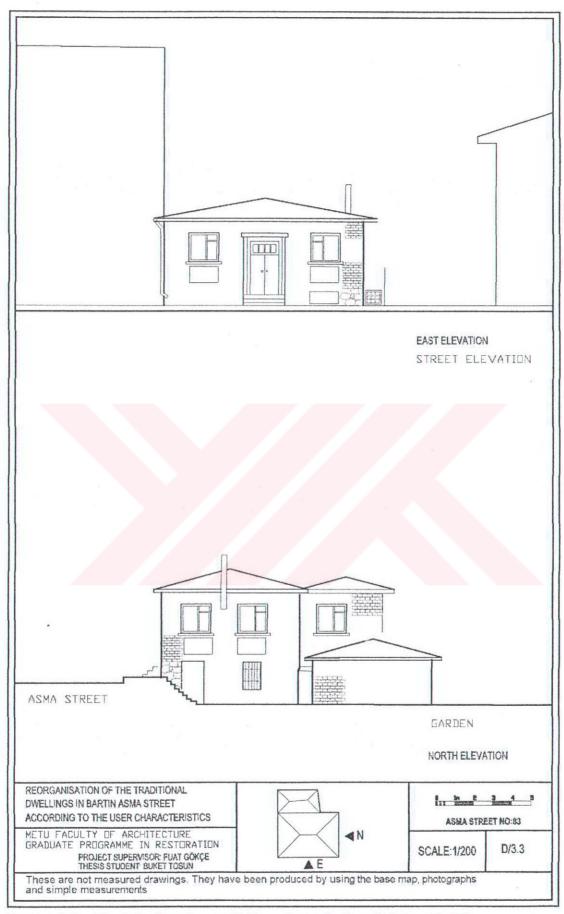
Sketch Drawings of Facades of the Building No:83
